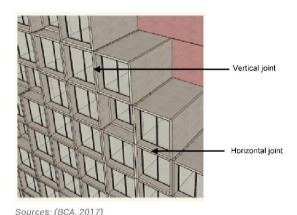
Example of Typical Vertical and Horizontal Joint between VMs during Construction
